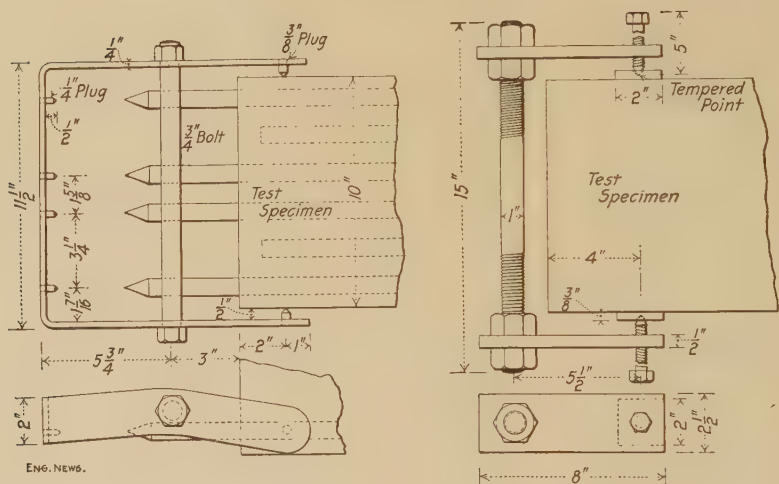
Details of Deflection Wire Support and End Clamp for Measuring Slips of Reinforcing Bar.
